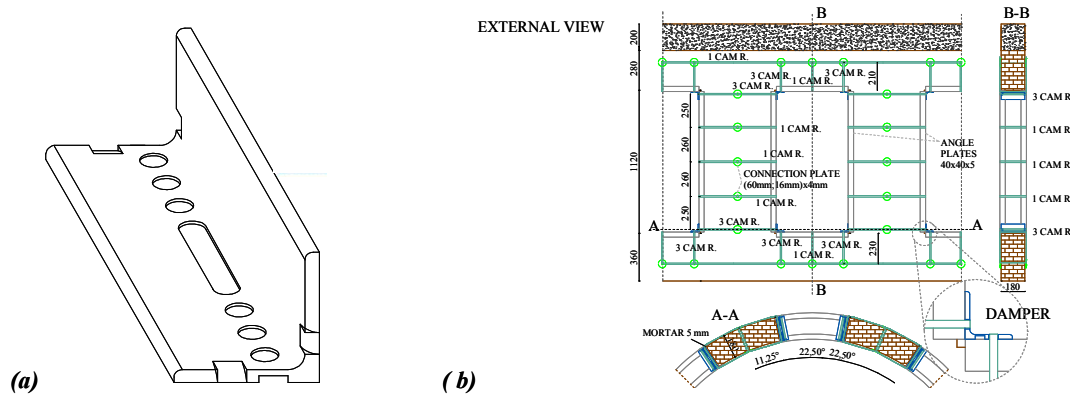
(a) Damper; (b) Design details of upgrading technique applied to S. Nicolò's tambour
